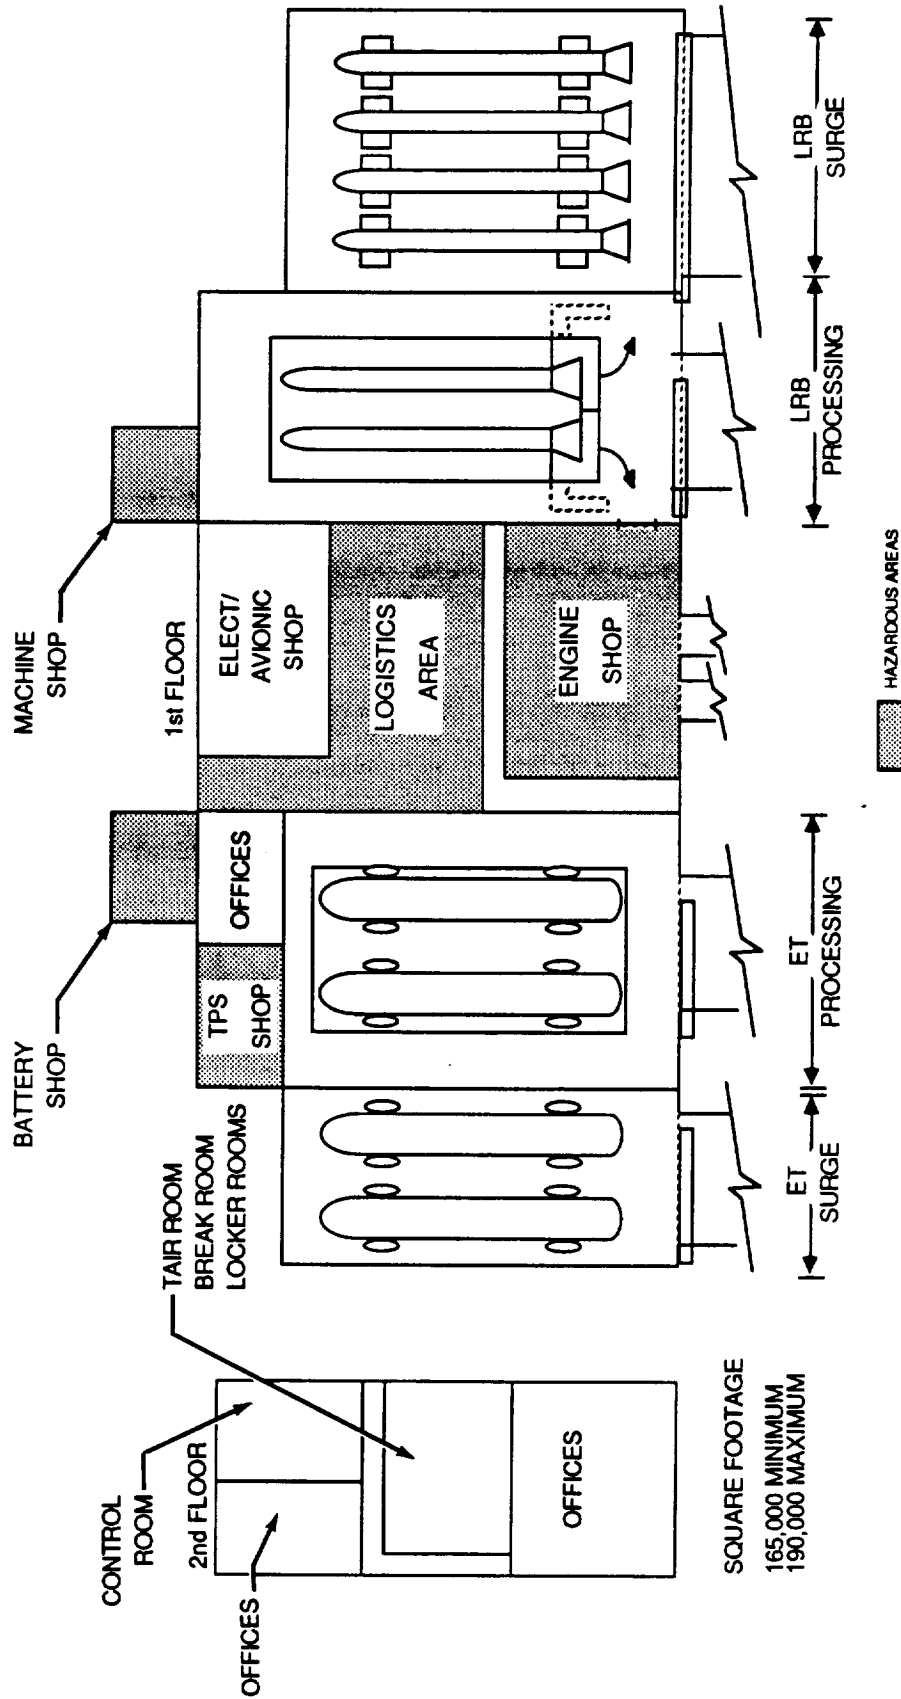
ET/LRB Checkout and Processing Facility
